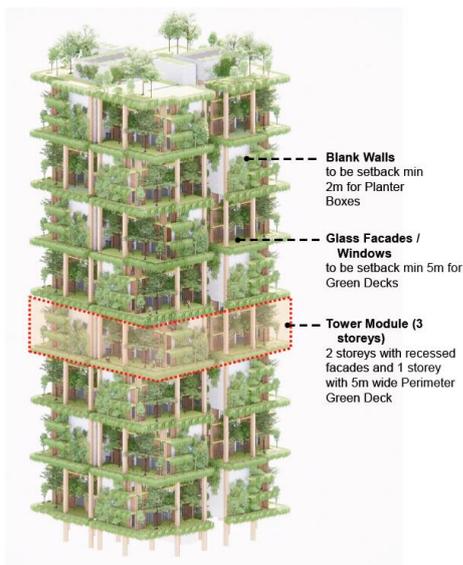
Greener facades to minimise bird strikes (Source: MKPL Architects)
